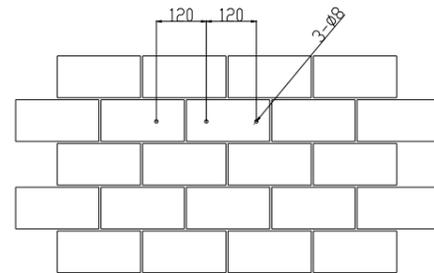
Drill holes' dimensions of R6-5-10K-S2-X, R6-5-10K-S3
